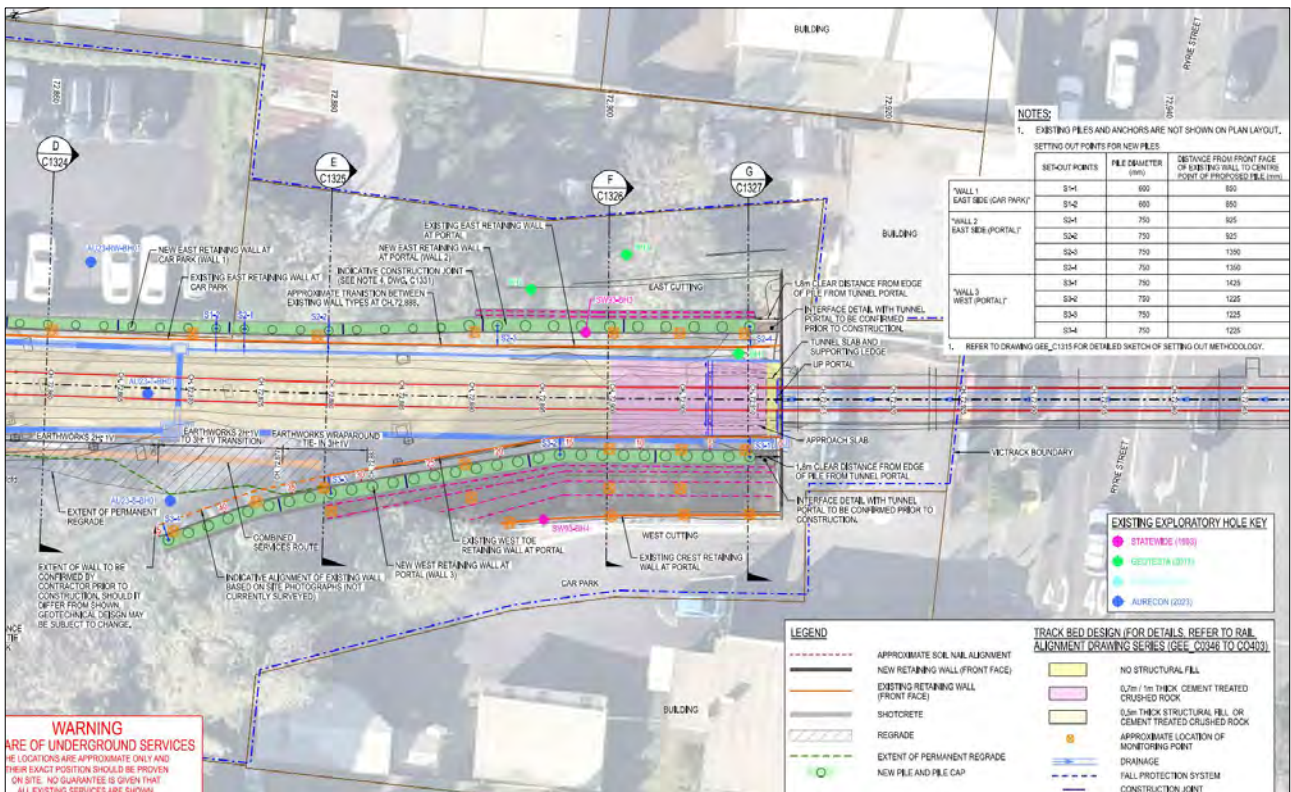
PLAN SHOWING RETAINING WORKS AT UP-END PORTAL. (SOURCE: AURECON/VLINE)
